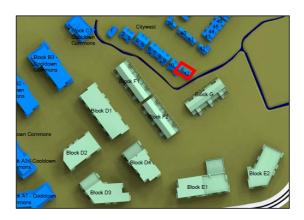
Proposed 3D drawing - Proposed Development illustrated in green
